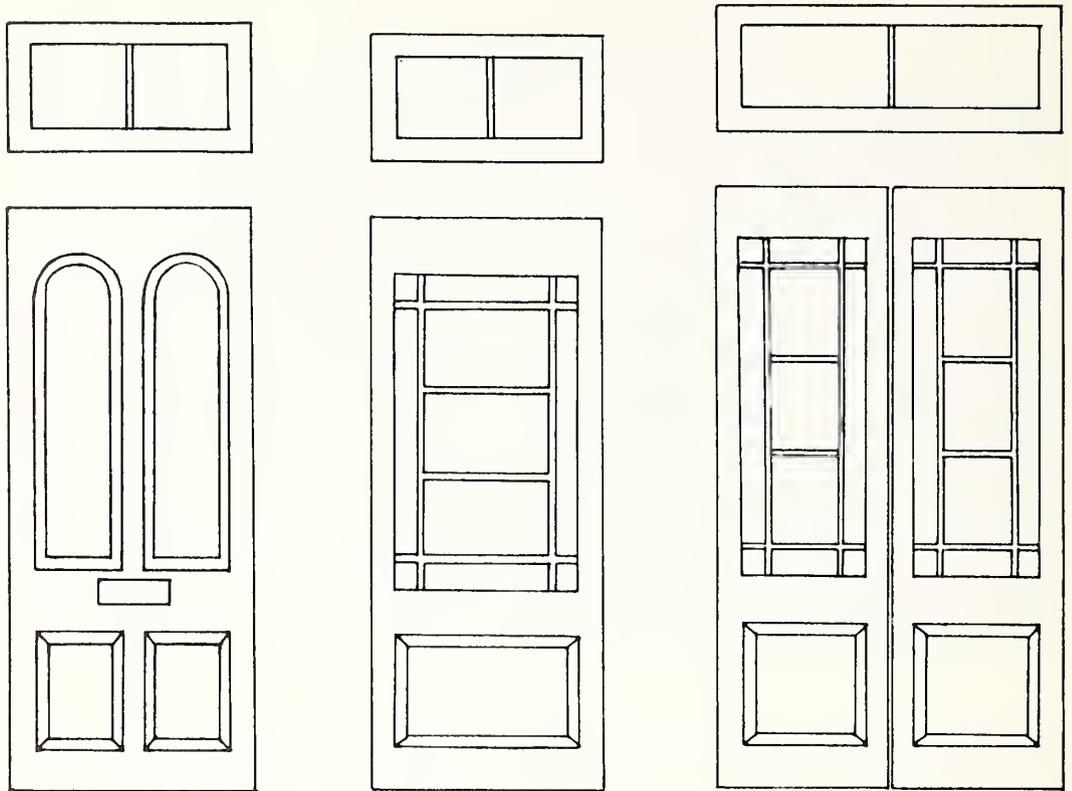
Front door (left), passage-kitchen door (middle) and French casement door (right), 4 Lake Street.
